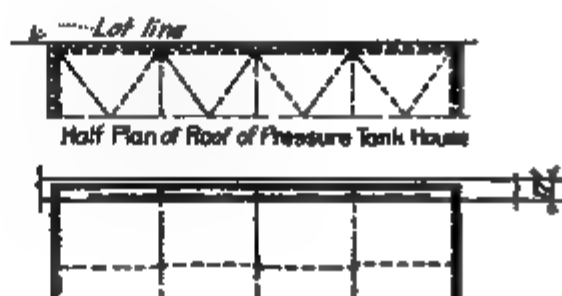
Sprinkler tank supports, using one wall of building and two new building columns.
